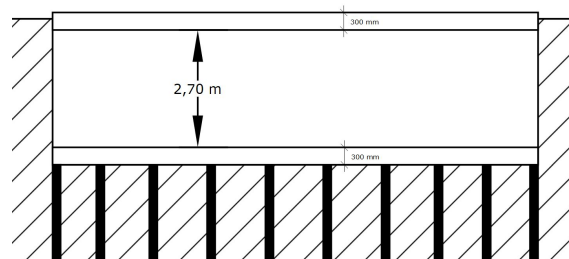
Section of the Ground Model with Basement Pile foundation
